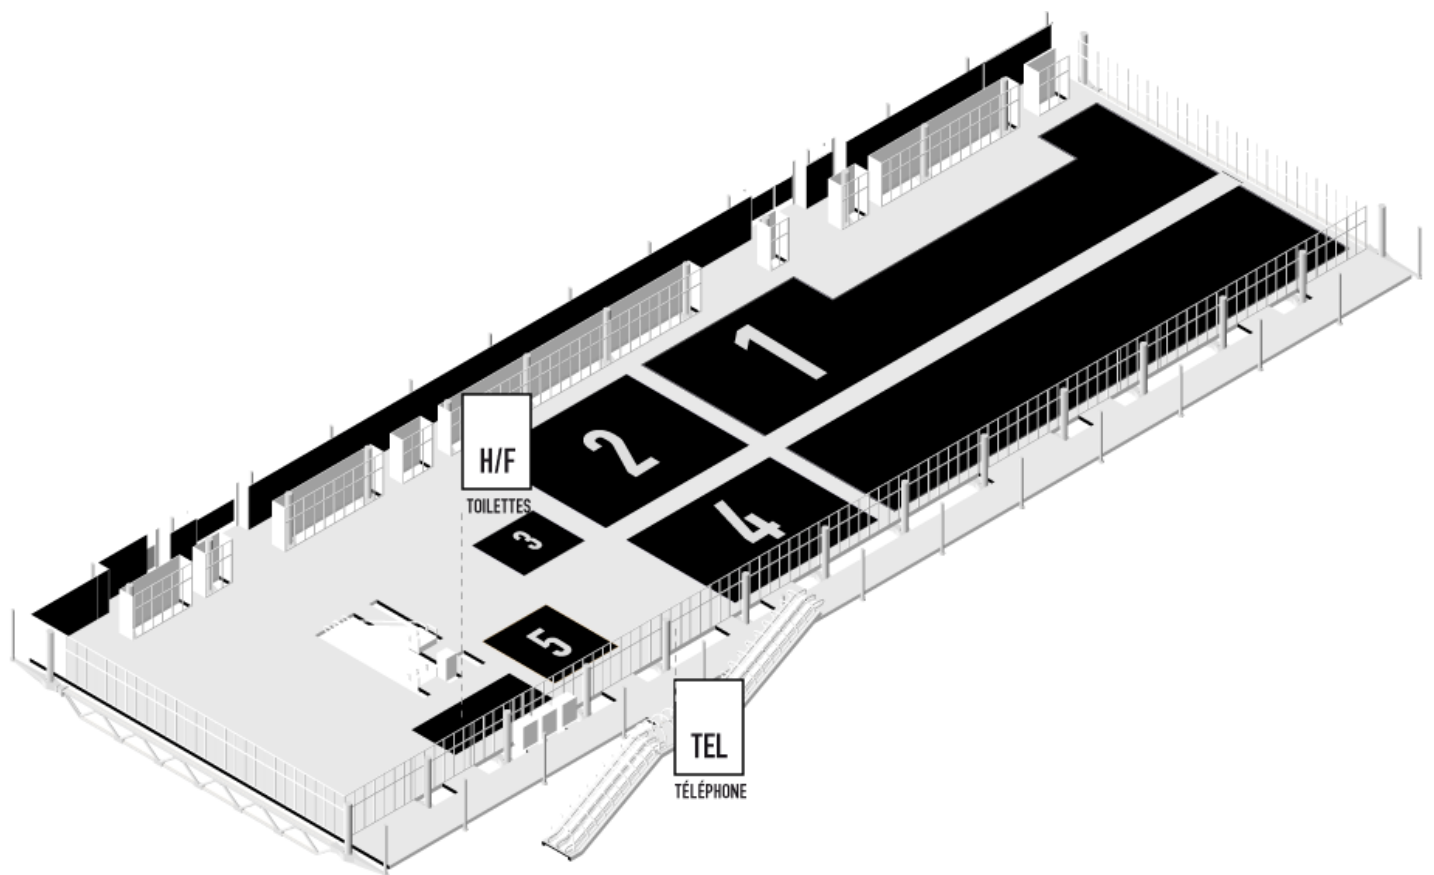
| First Floor Plan. Image by Lucas Flaa & Sean Ryan.
